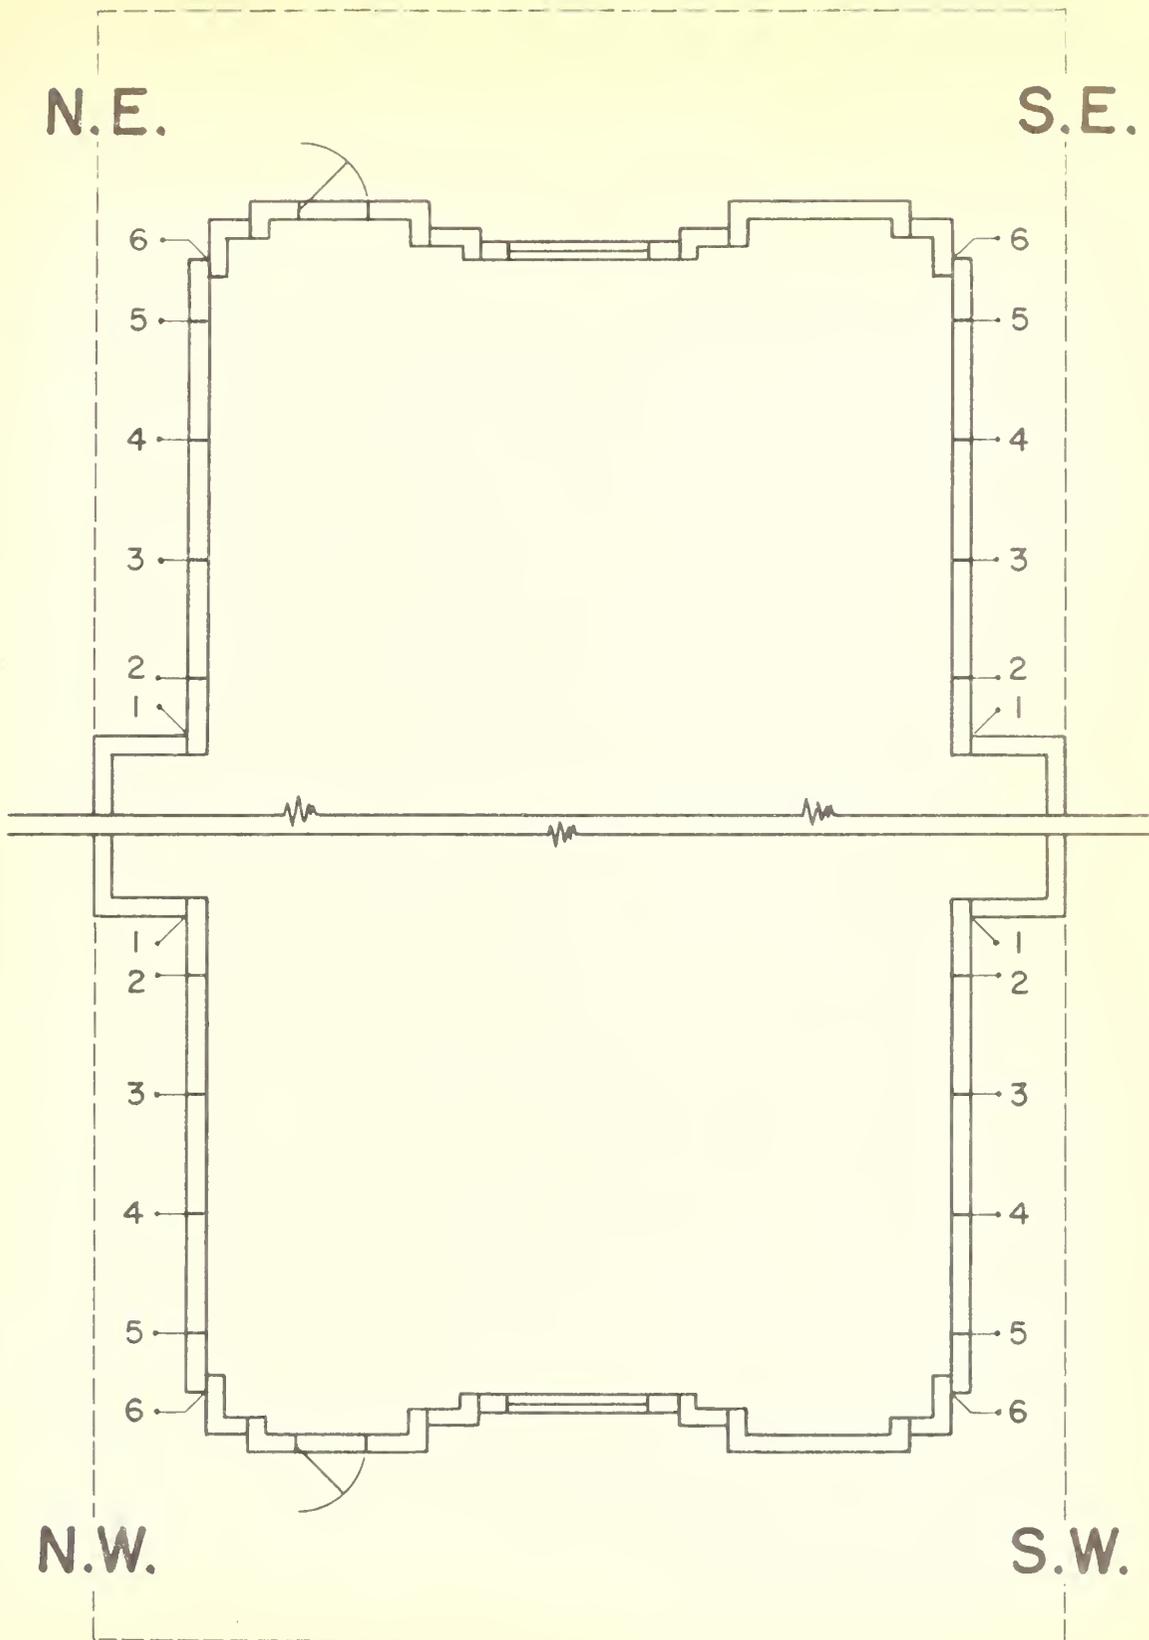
PLAN VIEW SHOWING LOCATION OF ALL GAGE STATIONS USED IN MEASUREMENT OF JOINT MOVEMENTS. (19TH FLOOR LEVEL, BUILDING NO. 1, NAVAL MEDICAL CENTER.)
